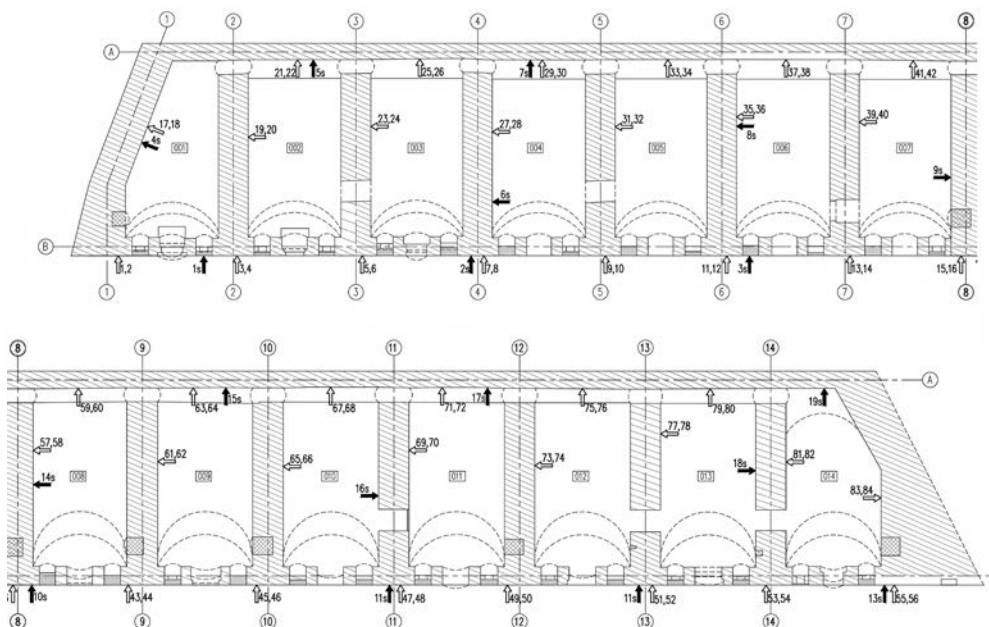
Ground plan of the White Barracks with marked sampling locations, white arrows – moisture testing, black arrows – salinity testing [Archives of the Department of Conservation of Monuments]
